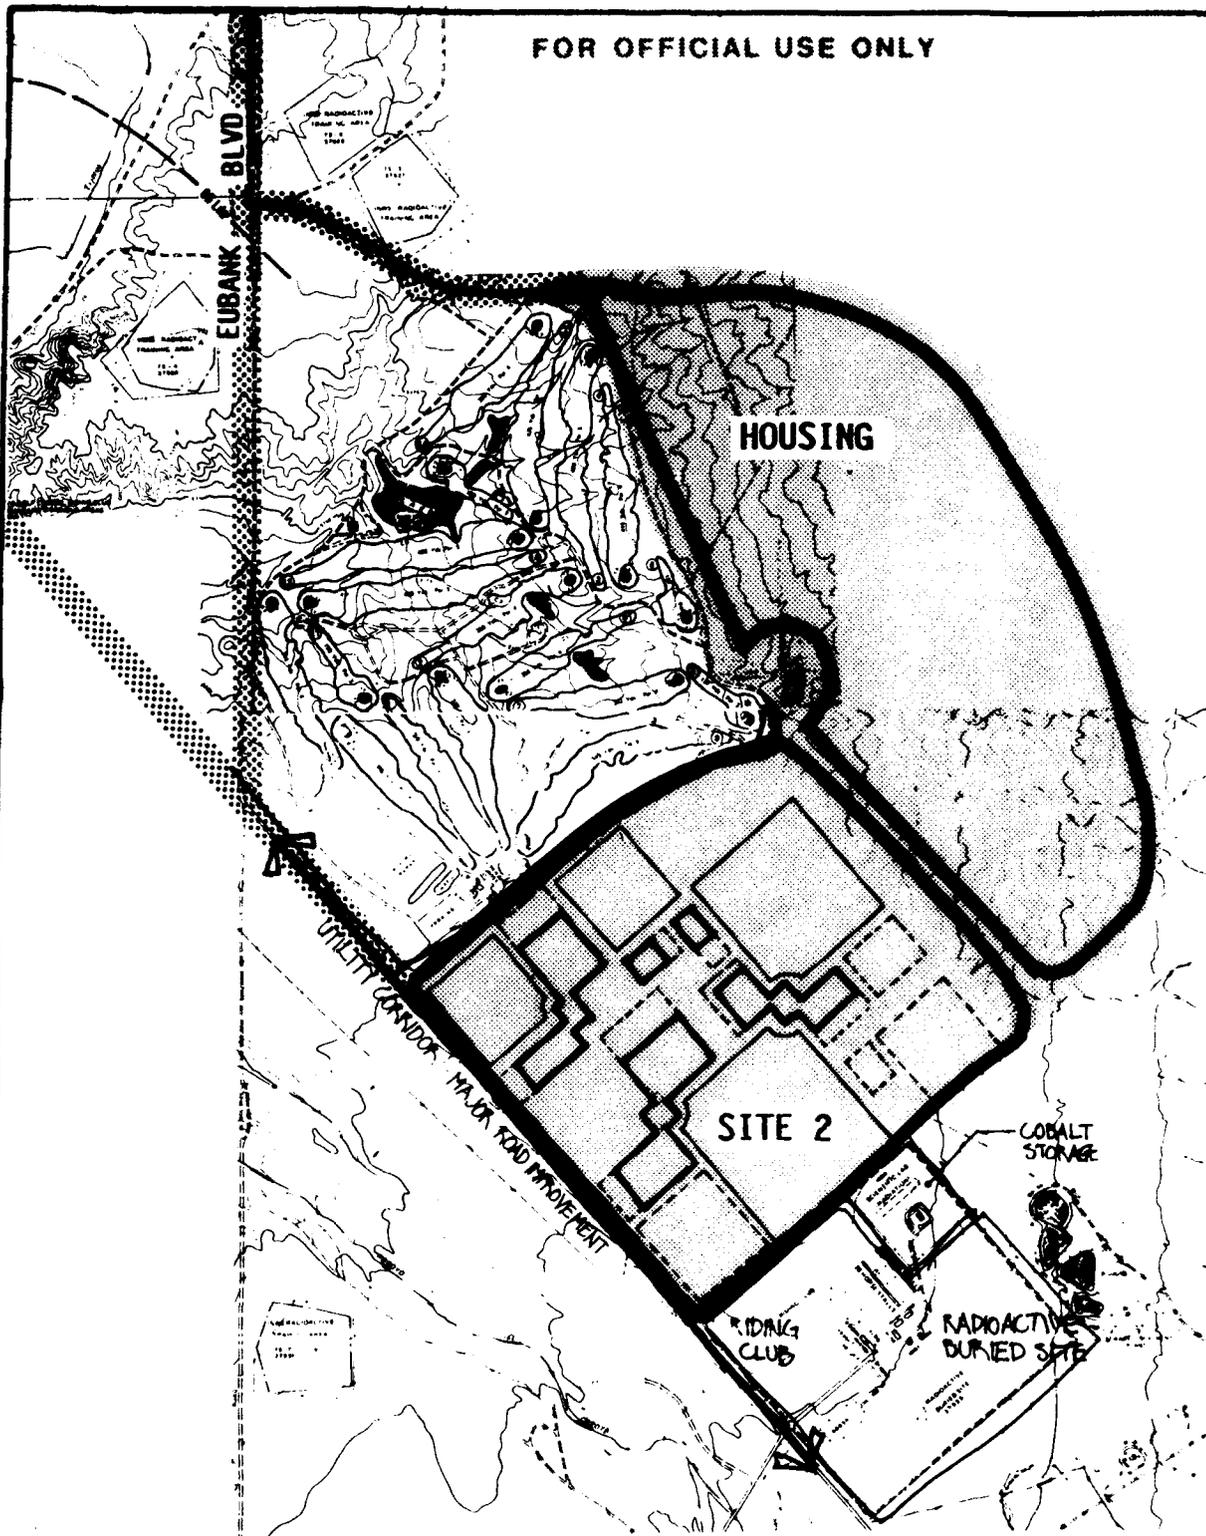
PROPOSED SITE 1A AT KIRTLAND AFB, NEW MEXICO
